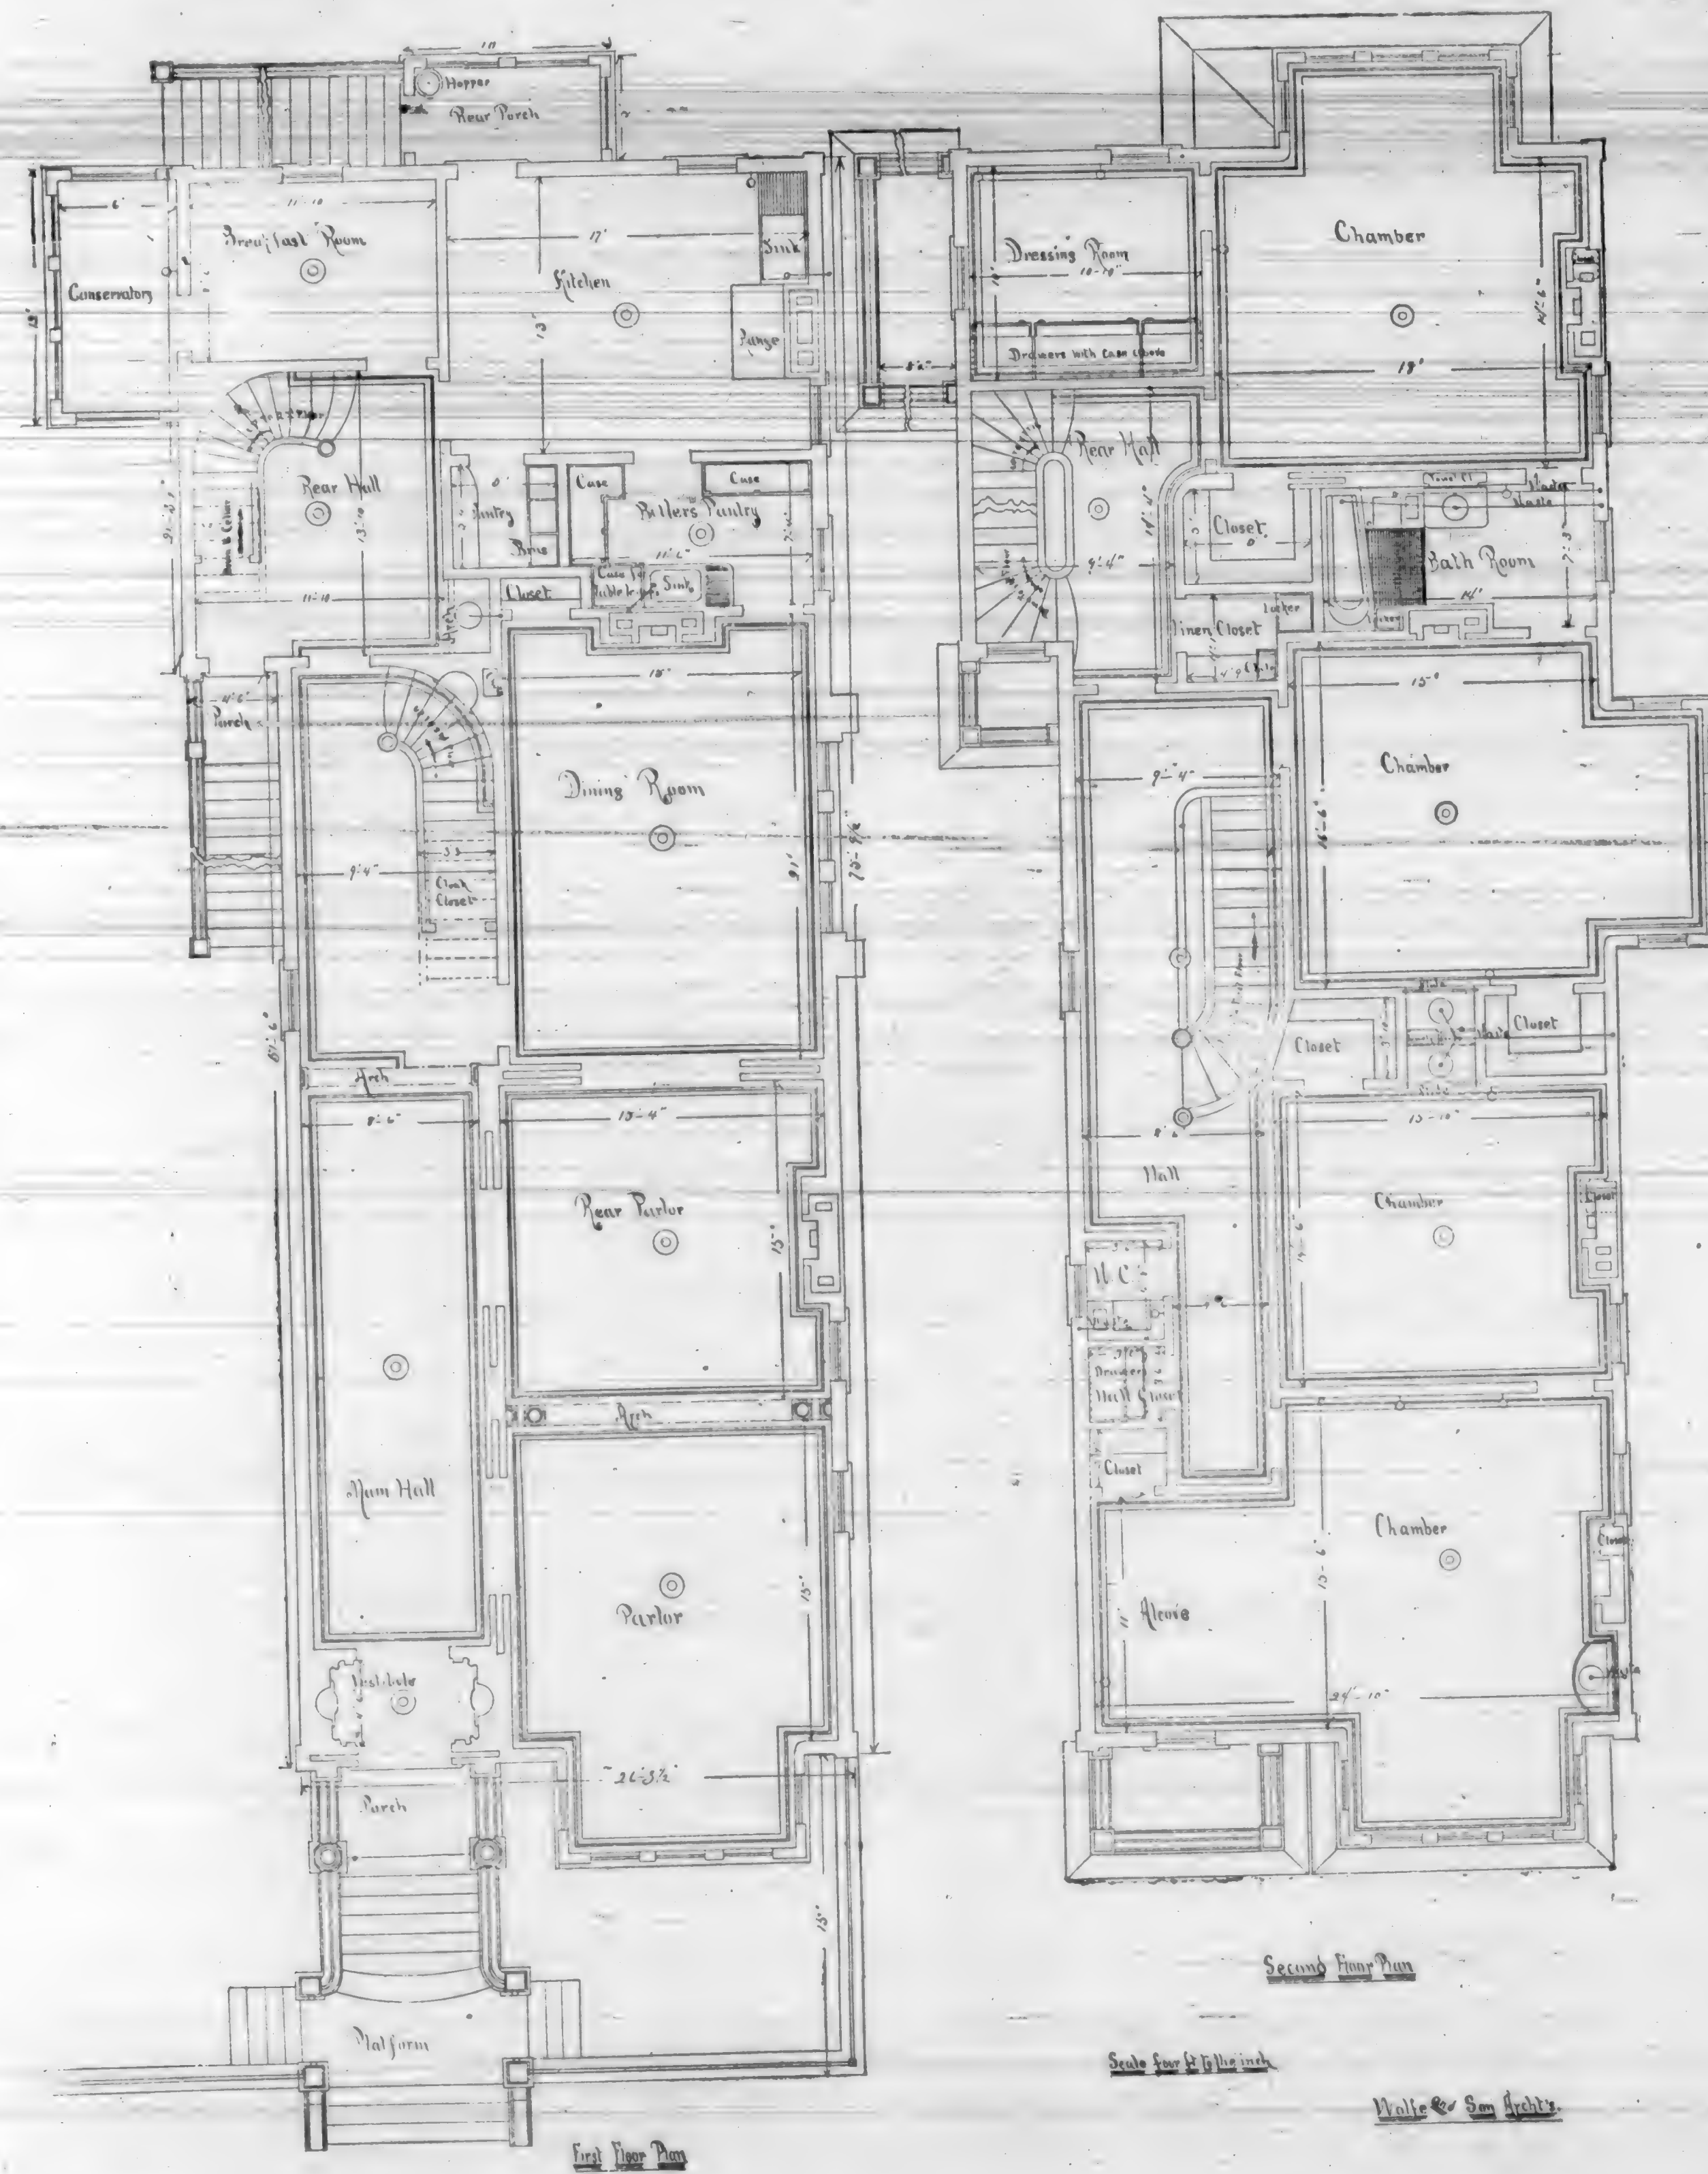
GROUND PLAN FOR PLATES 1 AND 2.
